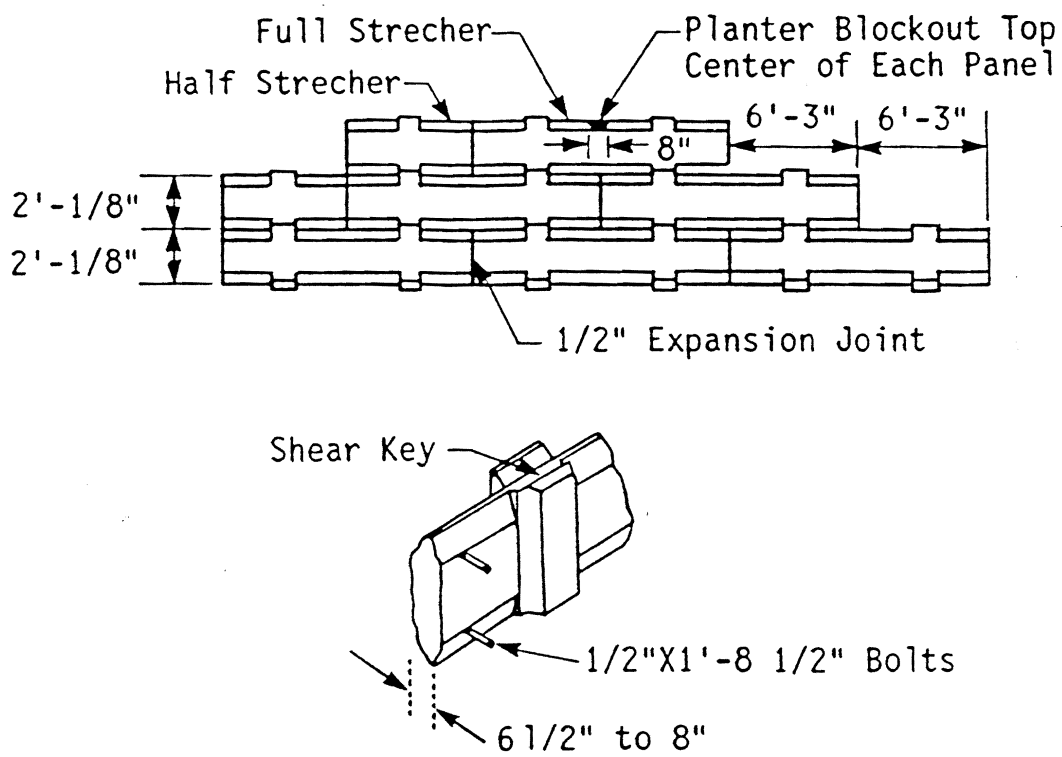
Facing panels for mechanically stabilized embankment wall system.
